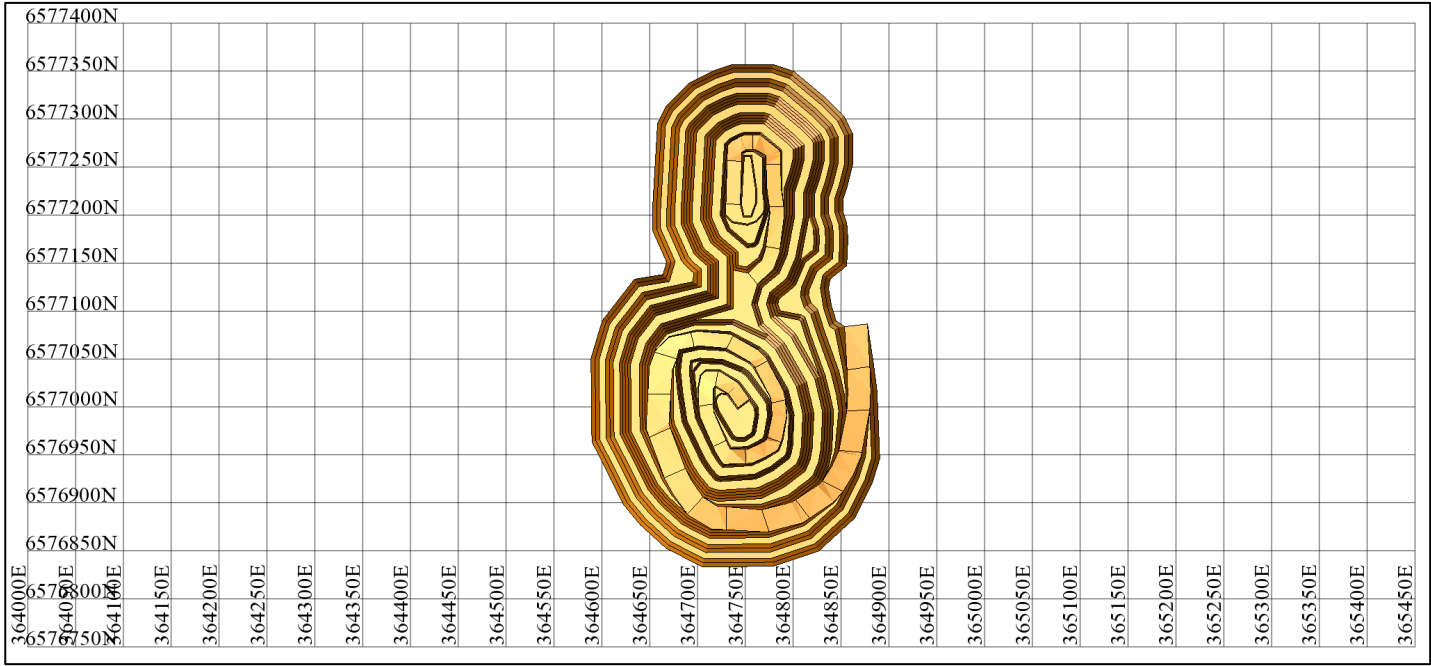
Kamperman pit design – Plan view - Reserve Case
